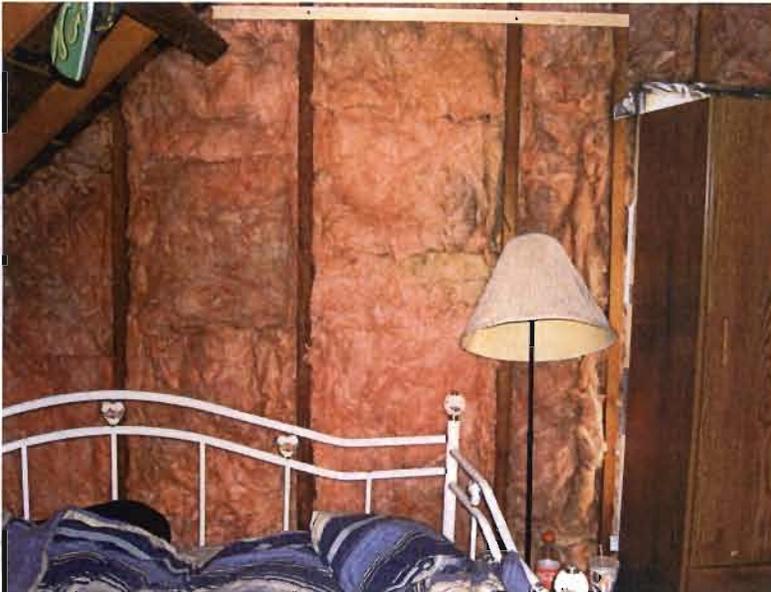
Insulation that was installed in bedroom on farm residence.
